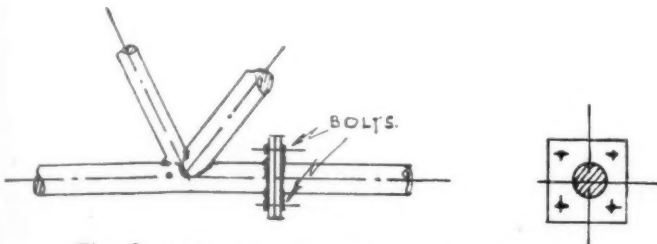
DETAIL. JOINT FOR SMALL SPANS.
